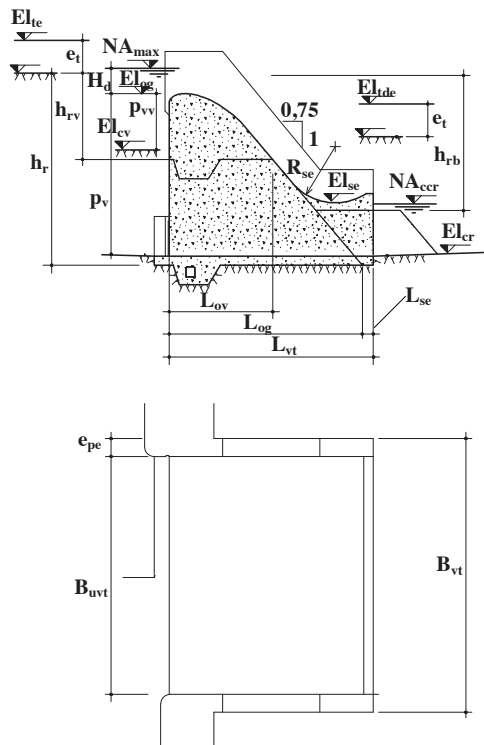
Typical cross-section and plan of an ungated surface spillway with a high ogee crest and a ski jump.
